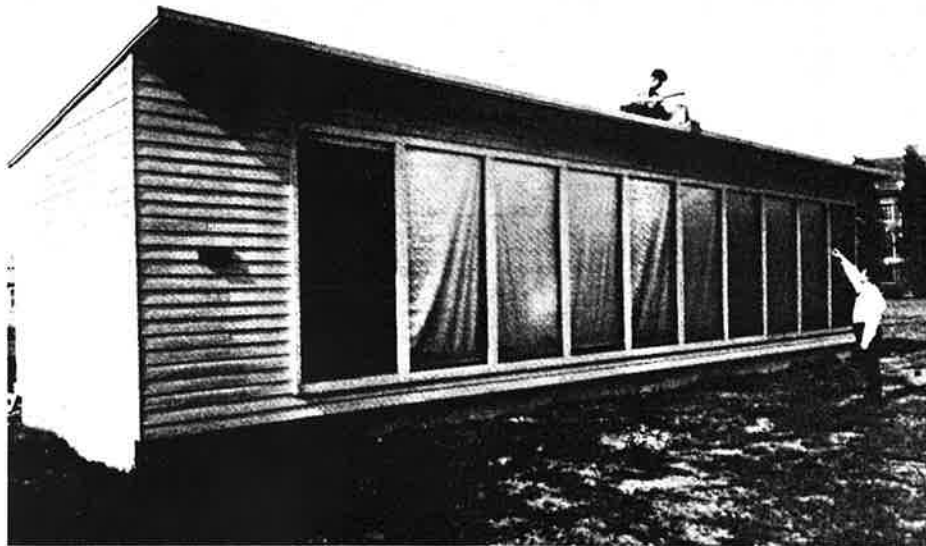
South wall of the laboratory used by MIT for its experiments with water wall solar collectors, insulating curtains are drawn in all but one unit.
